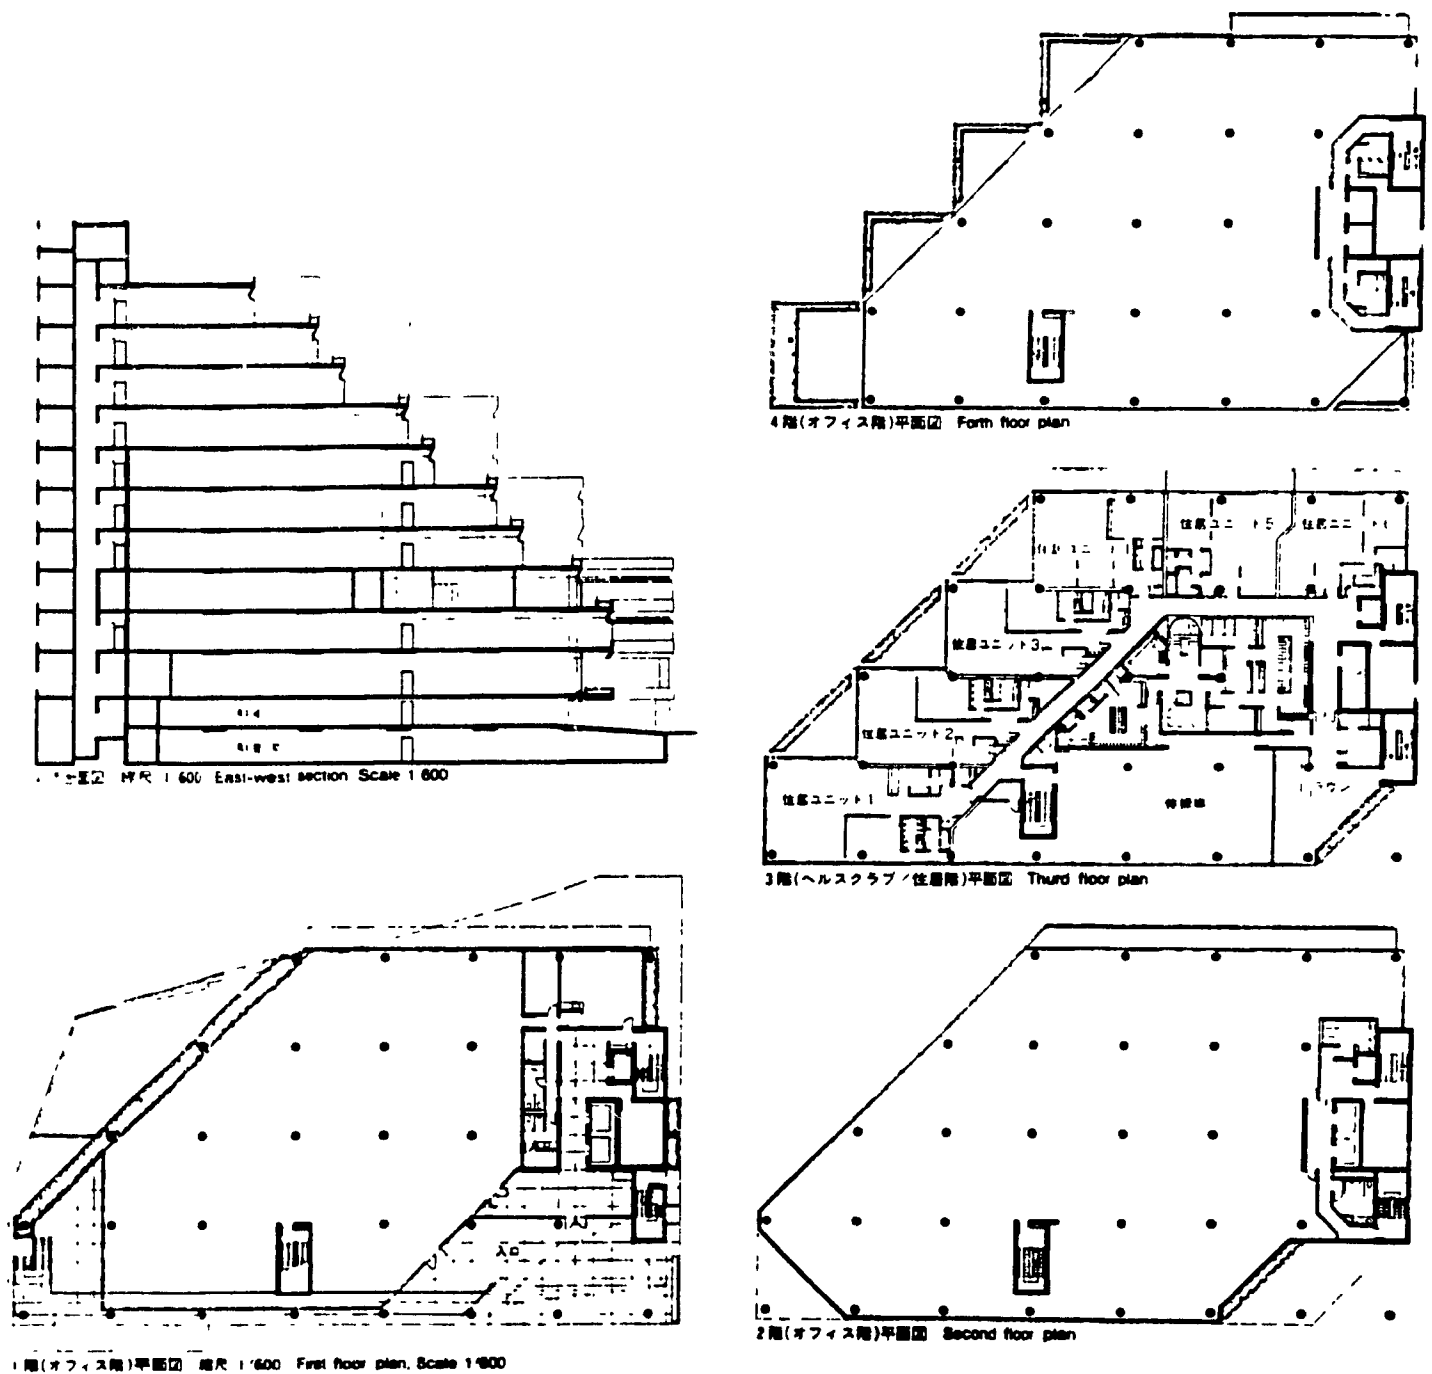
Plan and Section, Office Building by Arthur Erickson, Vancouver, B.C..
